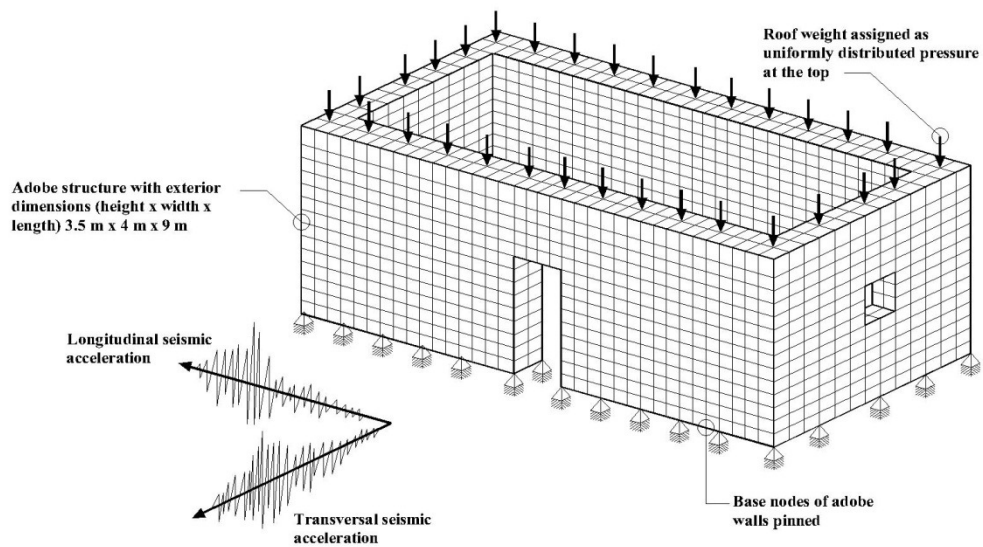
Finite element model used for examining the response of a traditional adobe masonry structure to dynamic loading.
